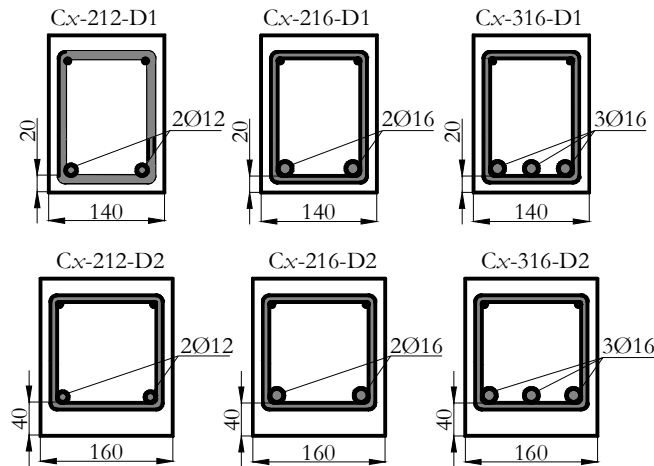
Geometric characteristics of sections (all dimensions in mm).
